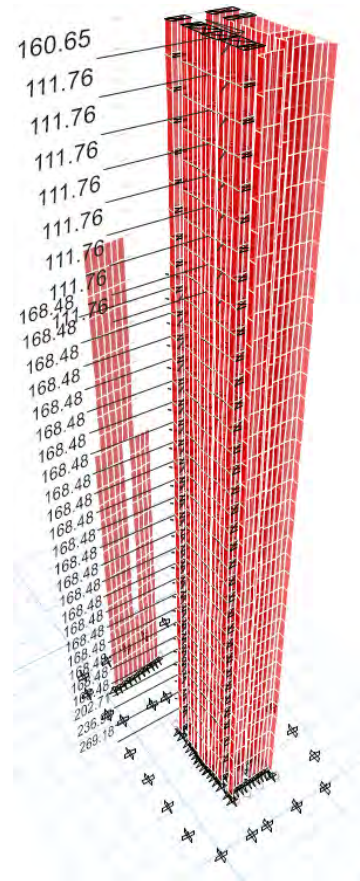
Lateral wind load path through floor plate to vertical stiff elements
